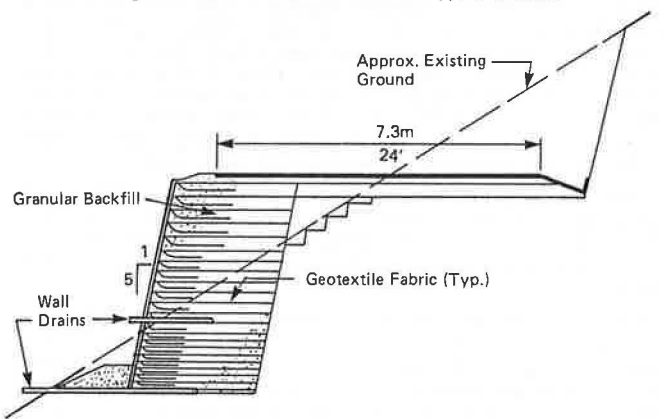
Geotextile Fabric Retaining Wall - Typical Section
